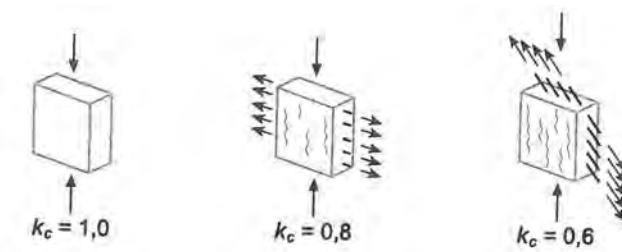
Reduction factor of SIA 262 [5] for compressive strength and shear wall with inclined reinforcement
